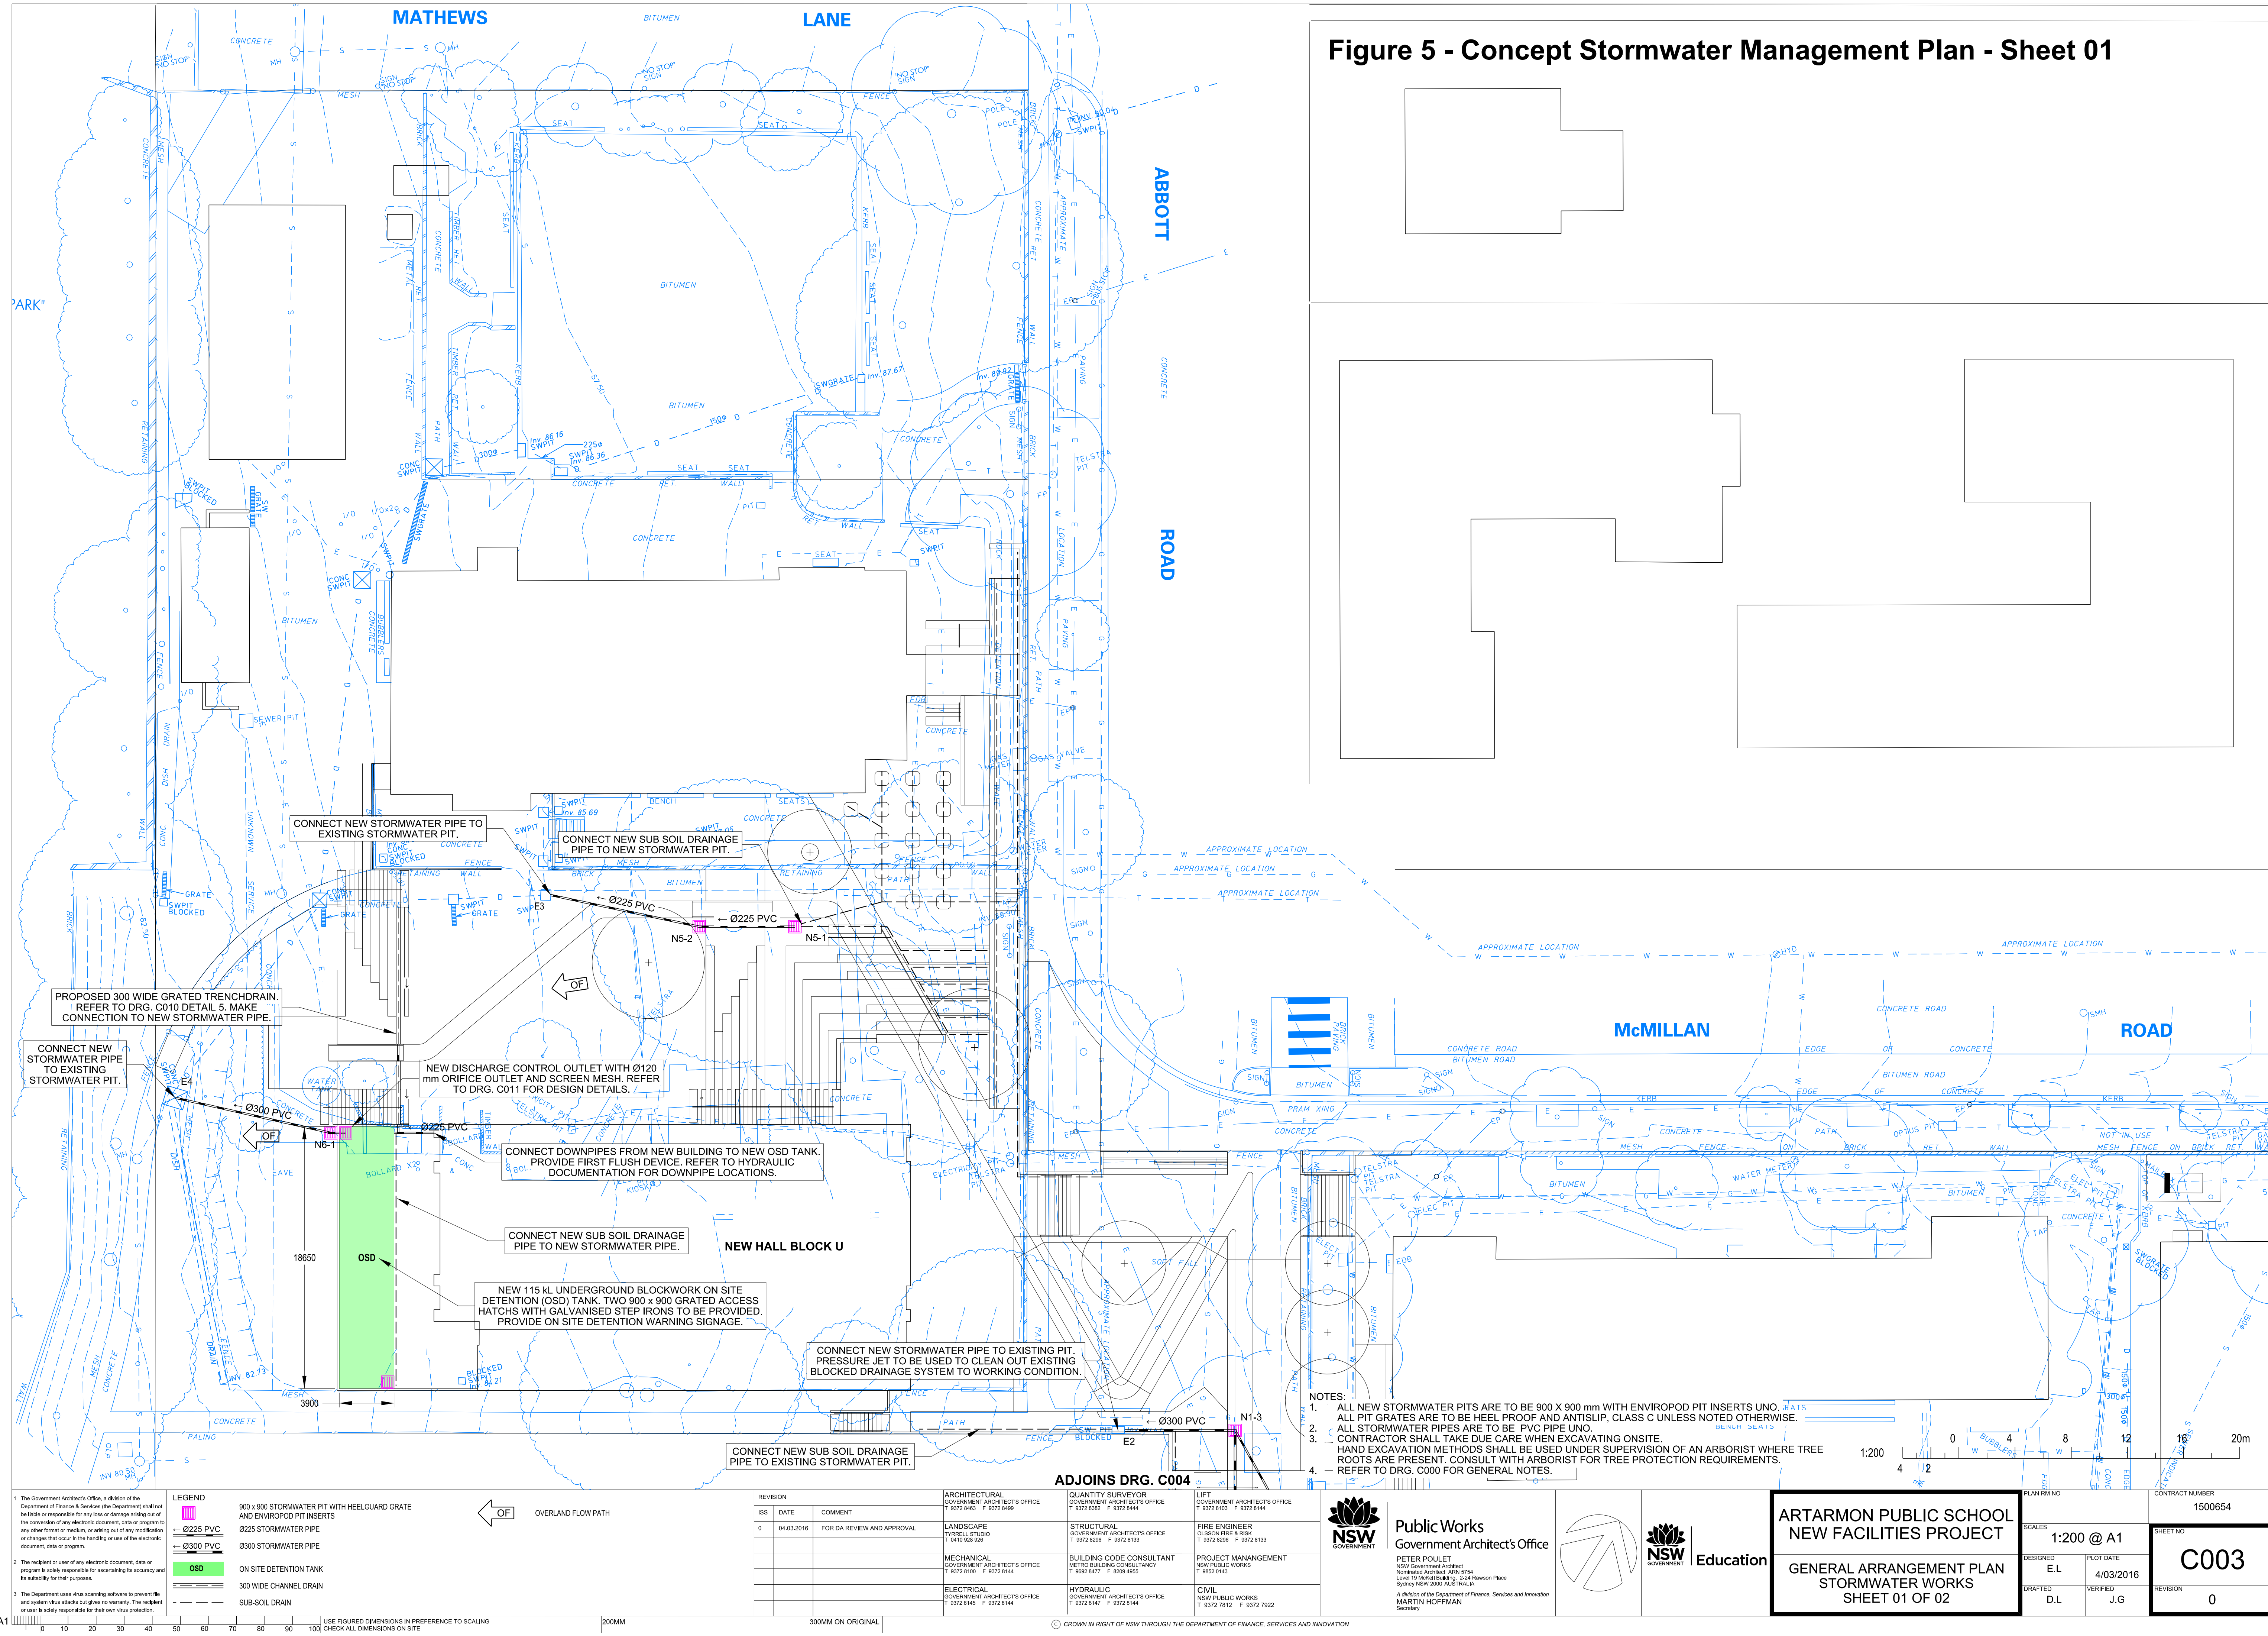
Concept Stormwater Management Plan - Sheet 01
